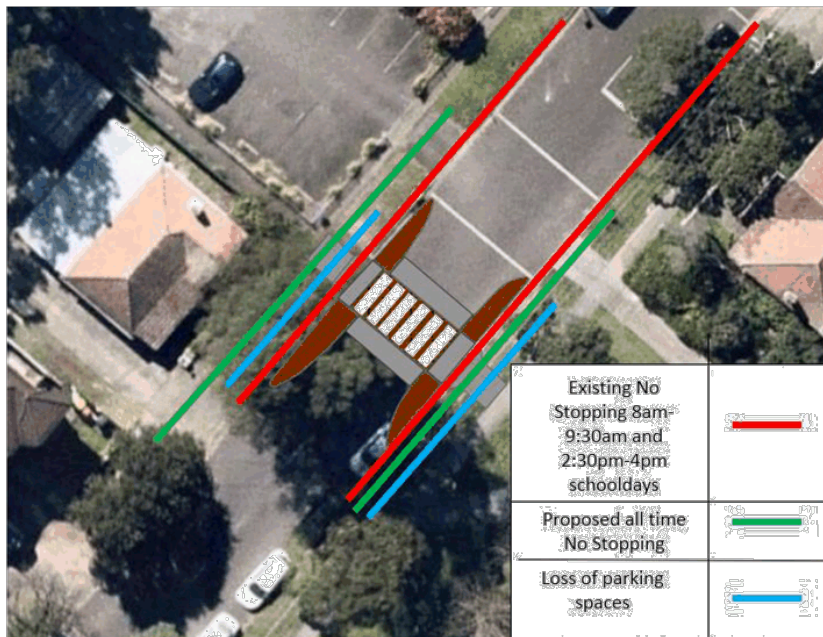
Concept design of a raised pedestrian crossing on Argyle Avenue, Ryde.
